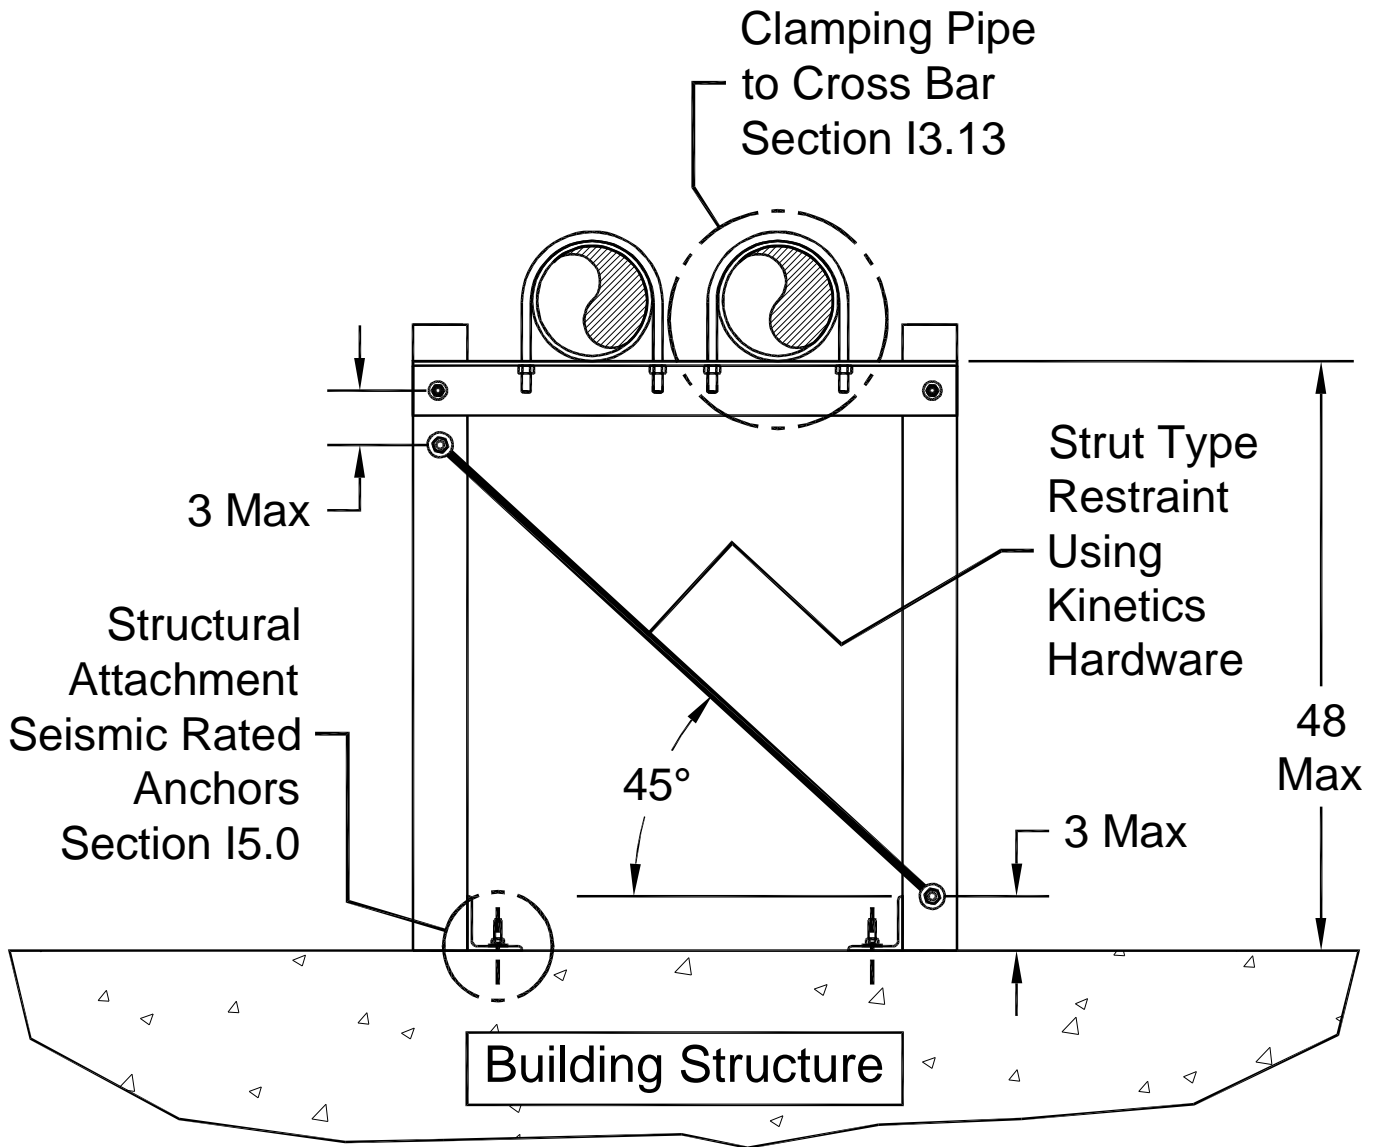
; Transverse (T) Strut Type Restraint Schematic for Floor/Roof Mounted Pipe – Cross Brace Strut at a 45° Angle
